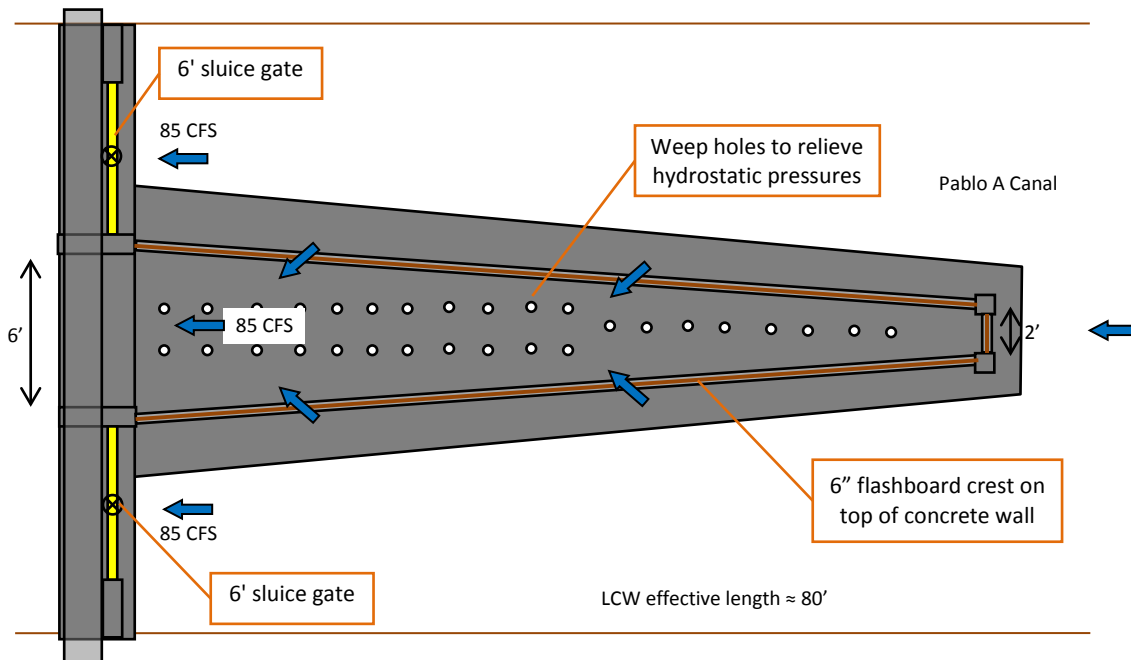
Conceptual plan view of new LCW structure in the Pablo A Canal downstream of the tunnel entrance to the Valley View Canal System (not to scale)
